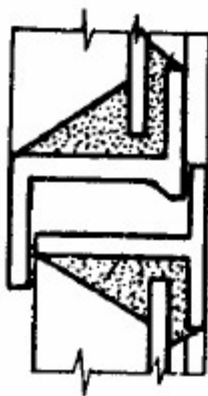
Detail Through Bottom of Top-Hung Ventilator
